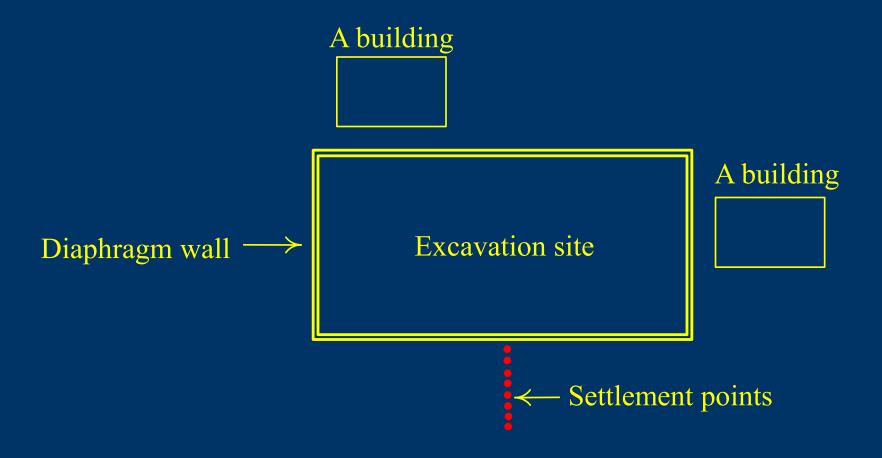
Buildings located at corners or along the shorter side of an excavation
